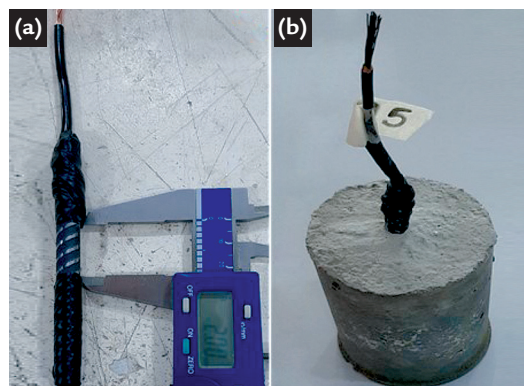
(a) exposed area of the coated steel bar, and (b) reinforced concrete sample.
